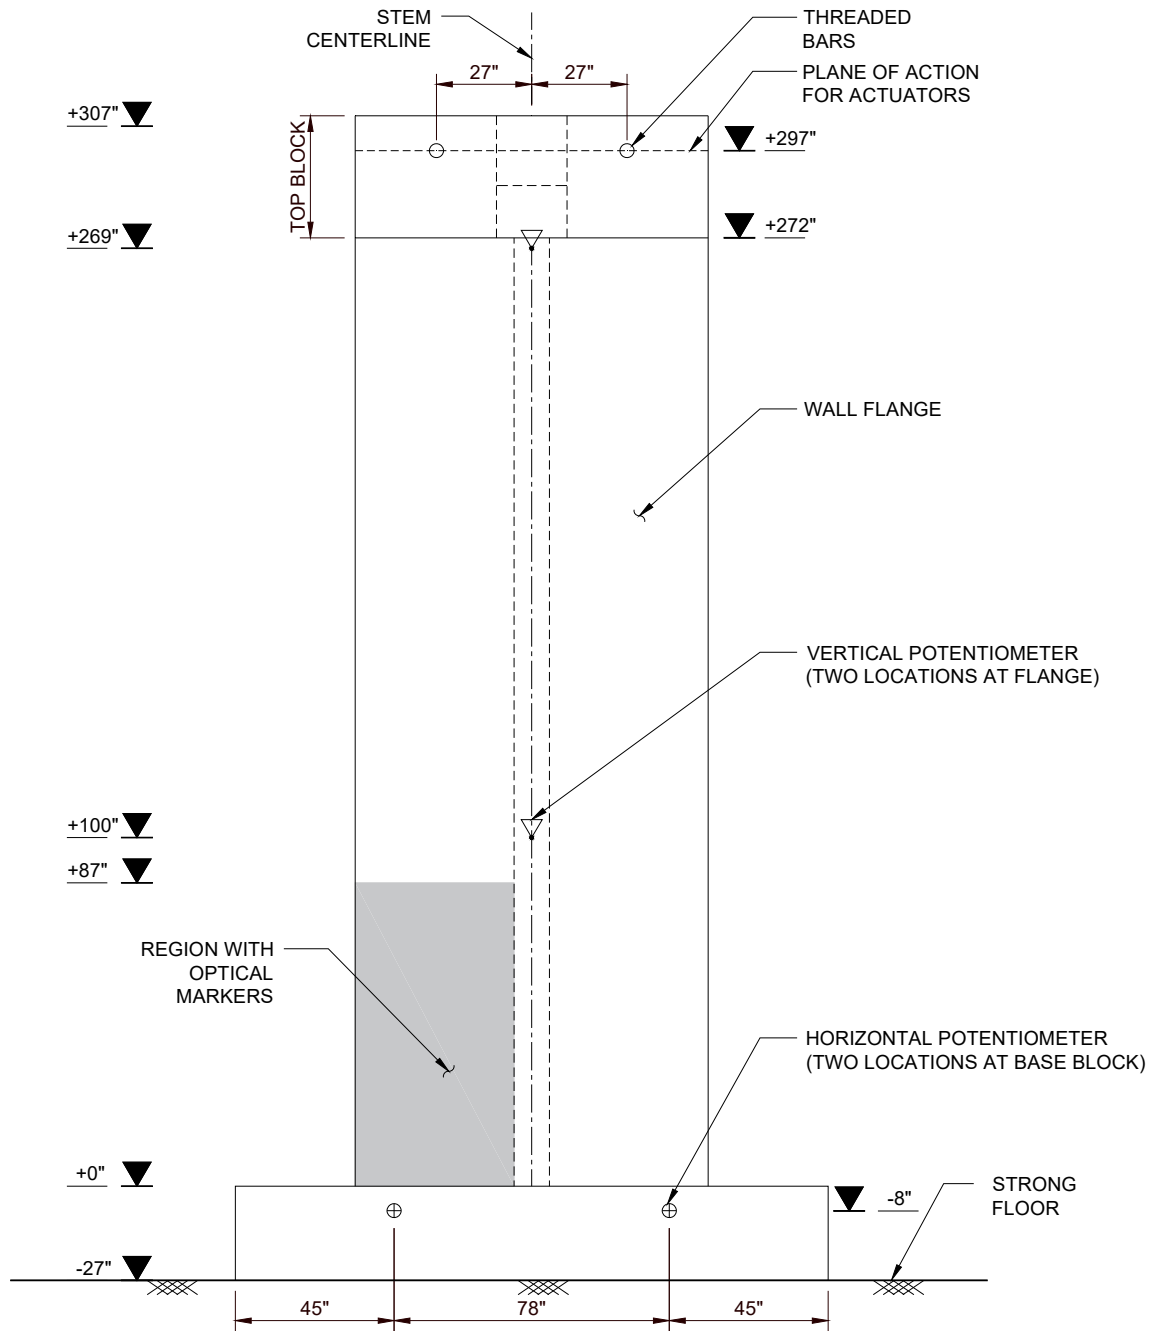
Wall instrumentation (elevation view of wall flange) (1 in. = 25.4 mm)
